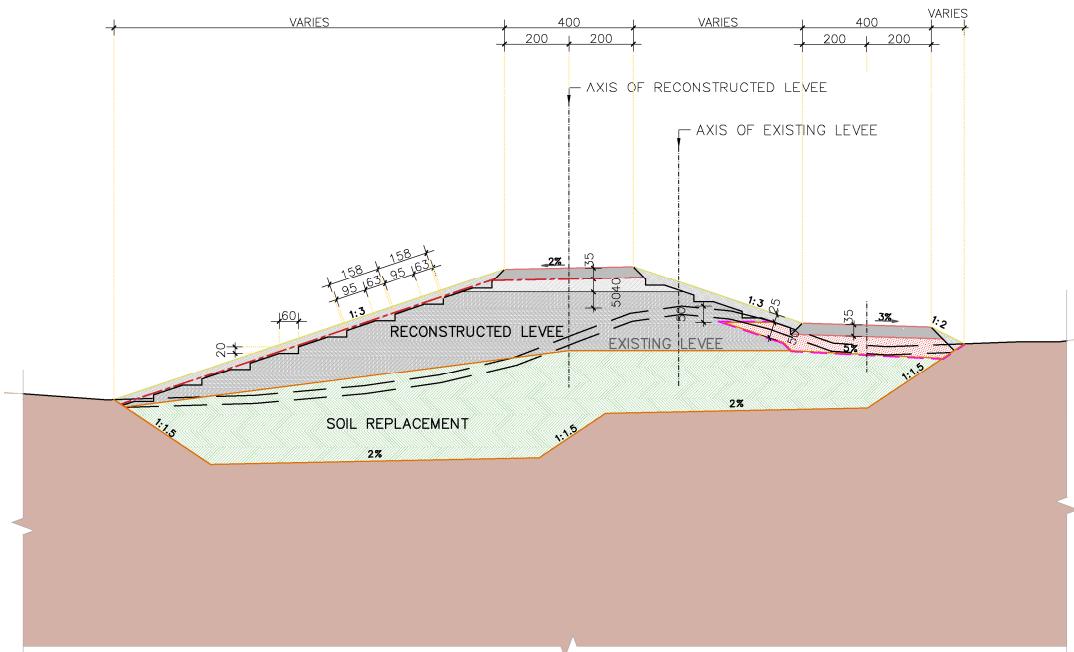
A cross section of reconstructed Pušćine levee (CFCE, 2022)
